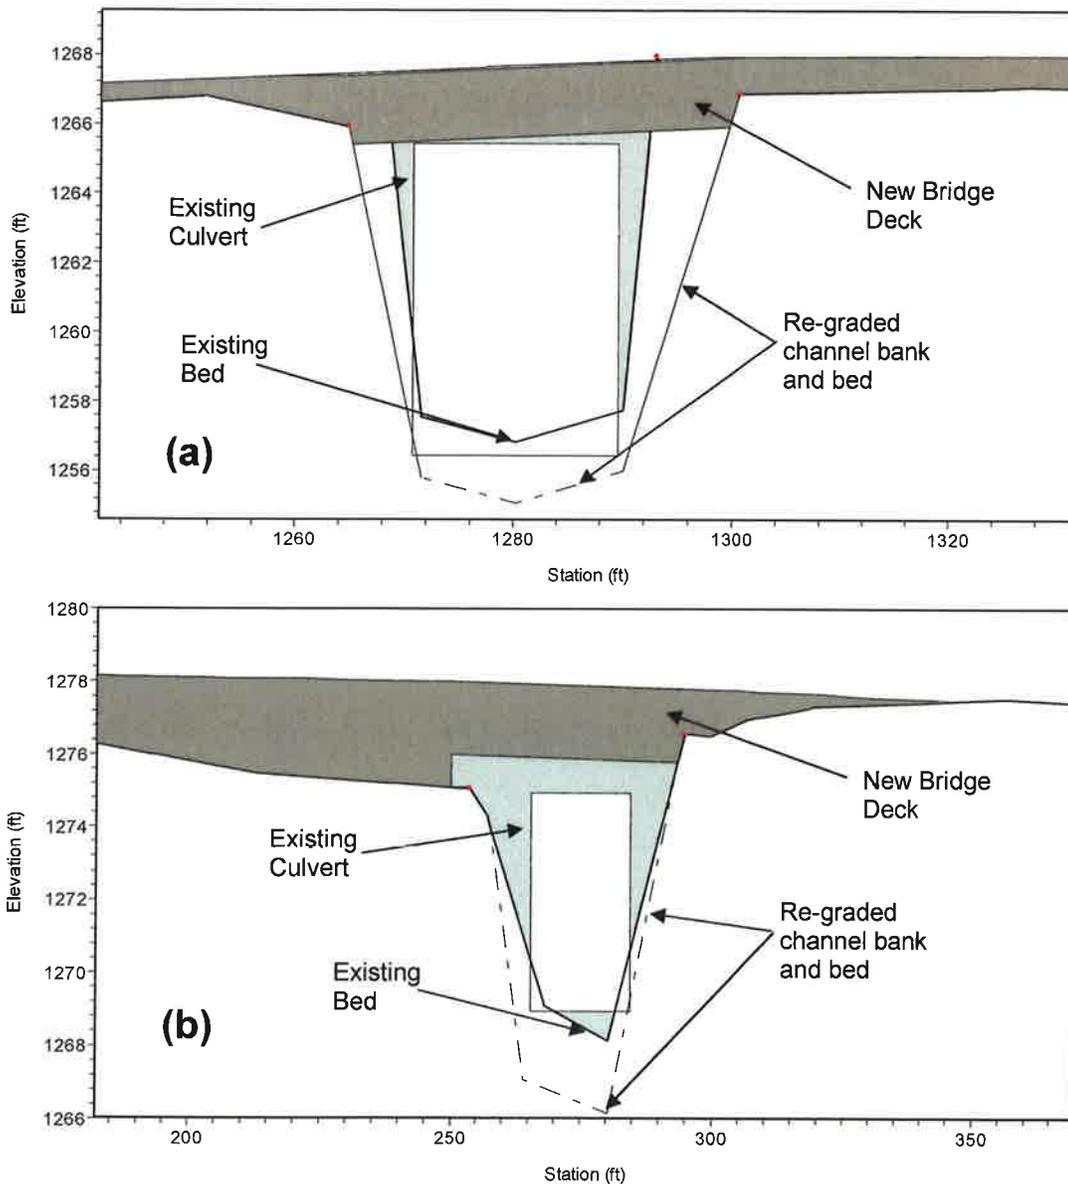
Bridge and cross-section modifications at (a) Taylor Avenue, and (b) West Pine Street.
